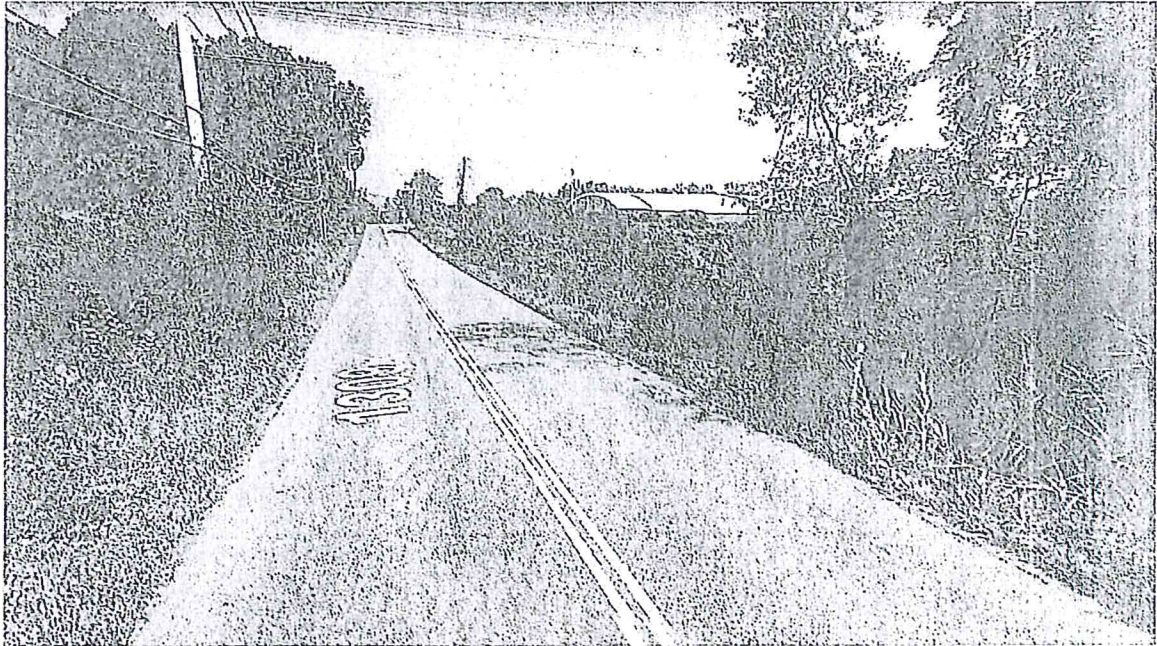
East Main Street west of Hill Blvd, within wetland A-4 buffer, facing east.
